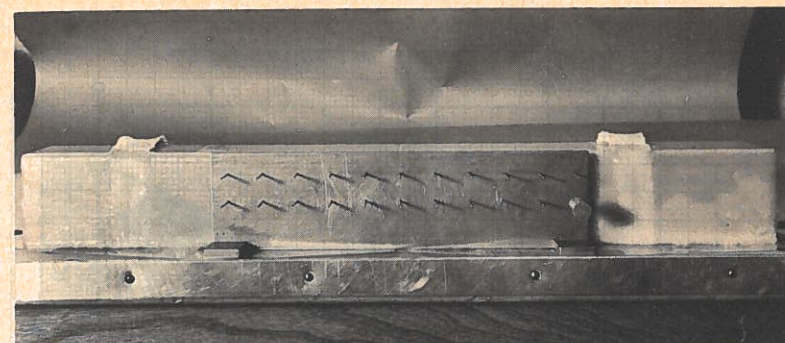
TEMPLATE FOR PLACING GRID PINS ON COATED BEAM (NOTE GAUZE HANDLING STRAPS)
